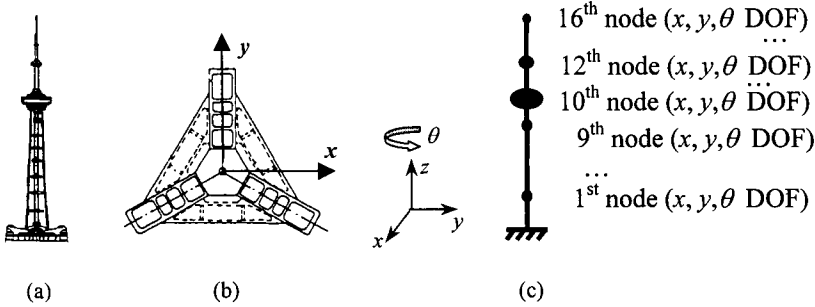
(a) Configuration of Nanjing Tower; (b) cross-section of concrete leg; (c) Discrete Structural Model
